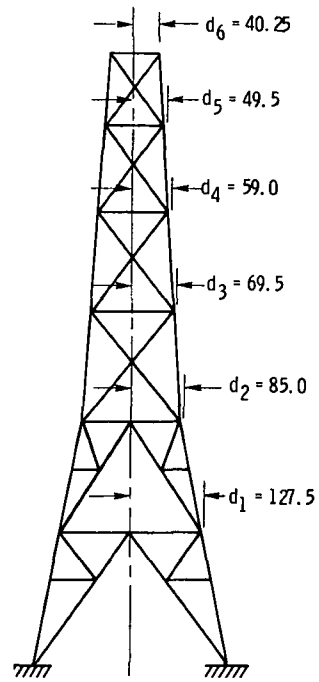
Arrangement of tower structure. (Dimensions are in inches.)
